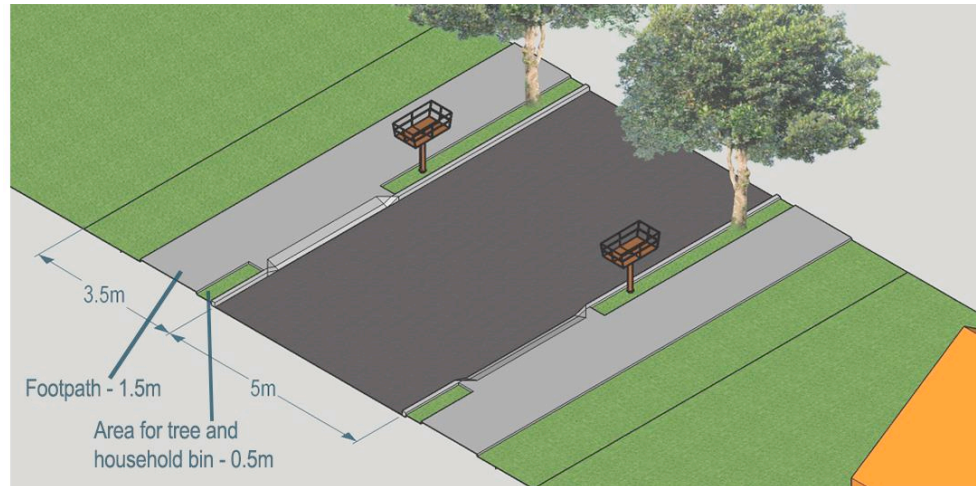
Proposal of wider pedestrian zones and narrower streets.
